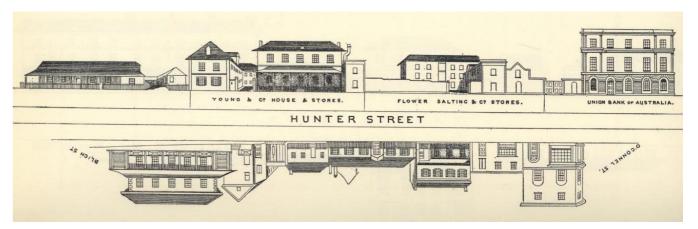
Facades of Hunter Street between O'Connell Street and Bligh Street in 1848. Source: Fowles 1882.
